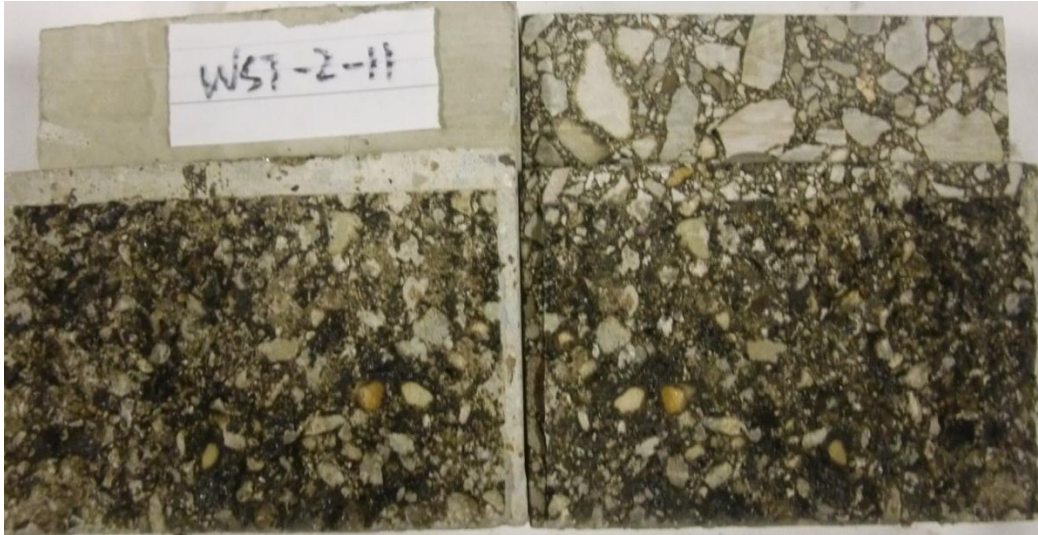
Failure surfaces of milled, dry and frozen specimen, WST-2-11.
